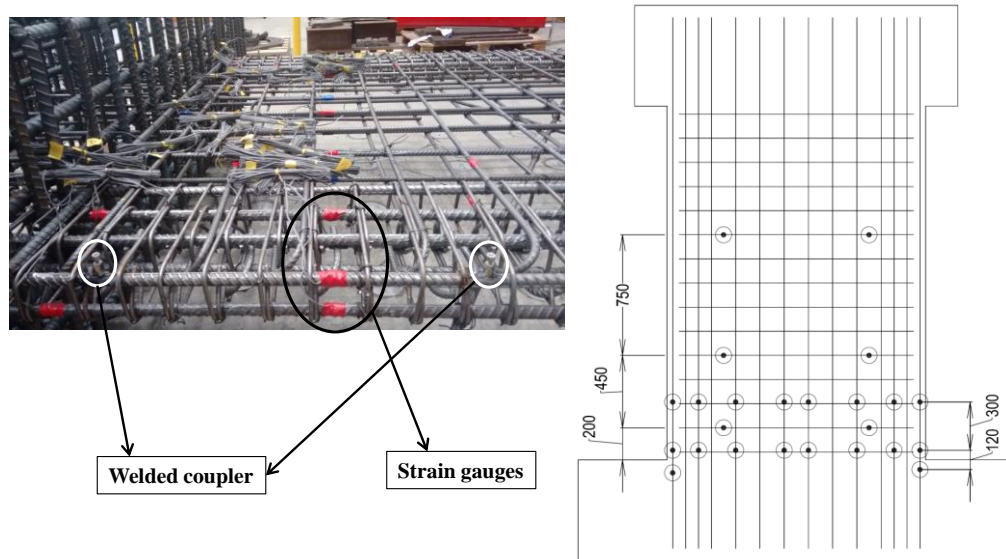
Strain gauges and the welded couplers used for instrumentation
